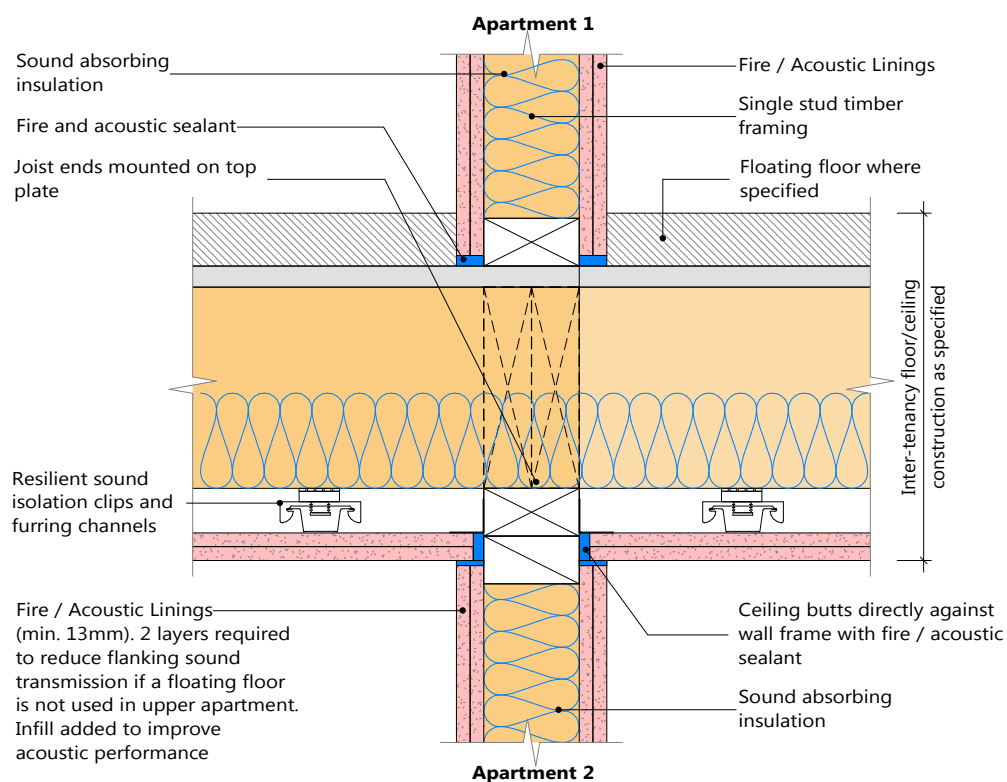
Internal load bearing wall top plate attached directly to joists. Joists running perpendicular to wall.
